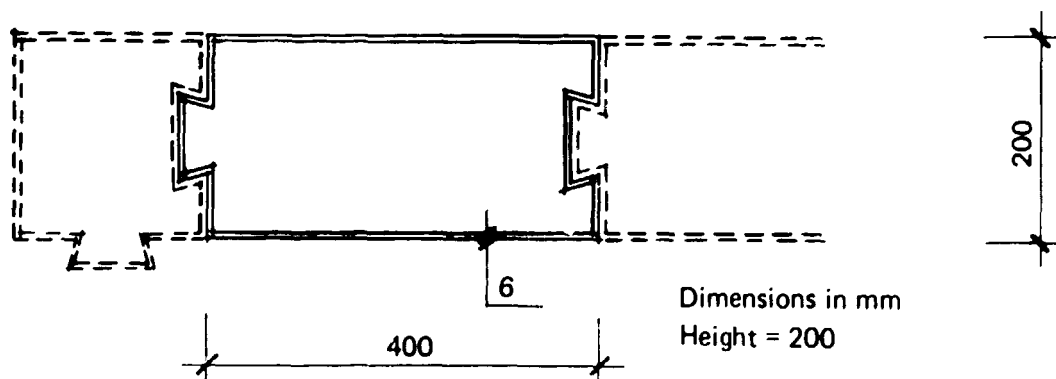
Figure XIX. Example of a hollow block without top or bottom with wall thickness of 6 mm
